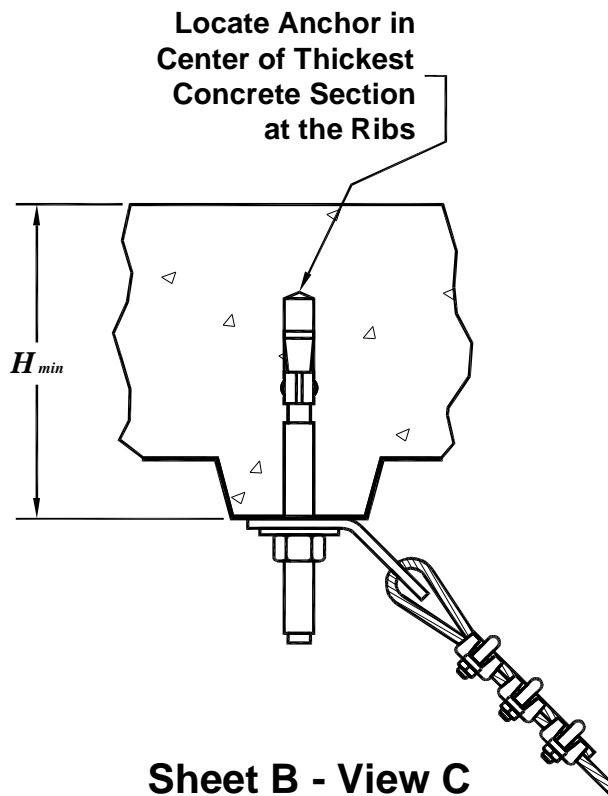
; KSCC Bracket Attached to Concrete Poured on Corrugated Metal Decking
